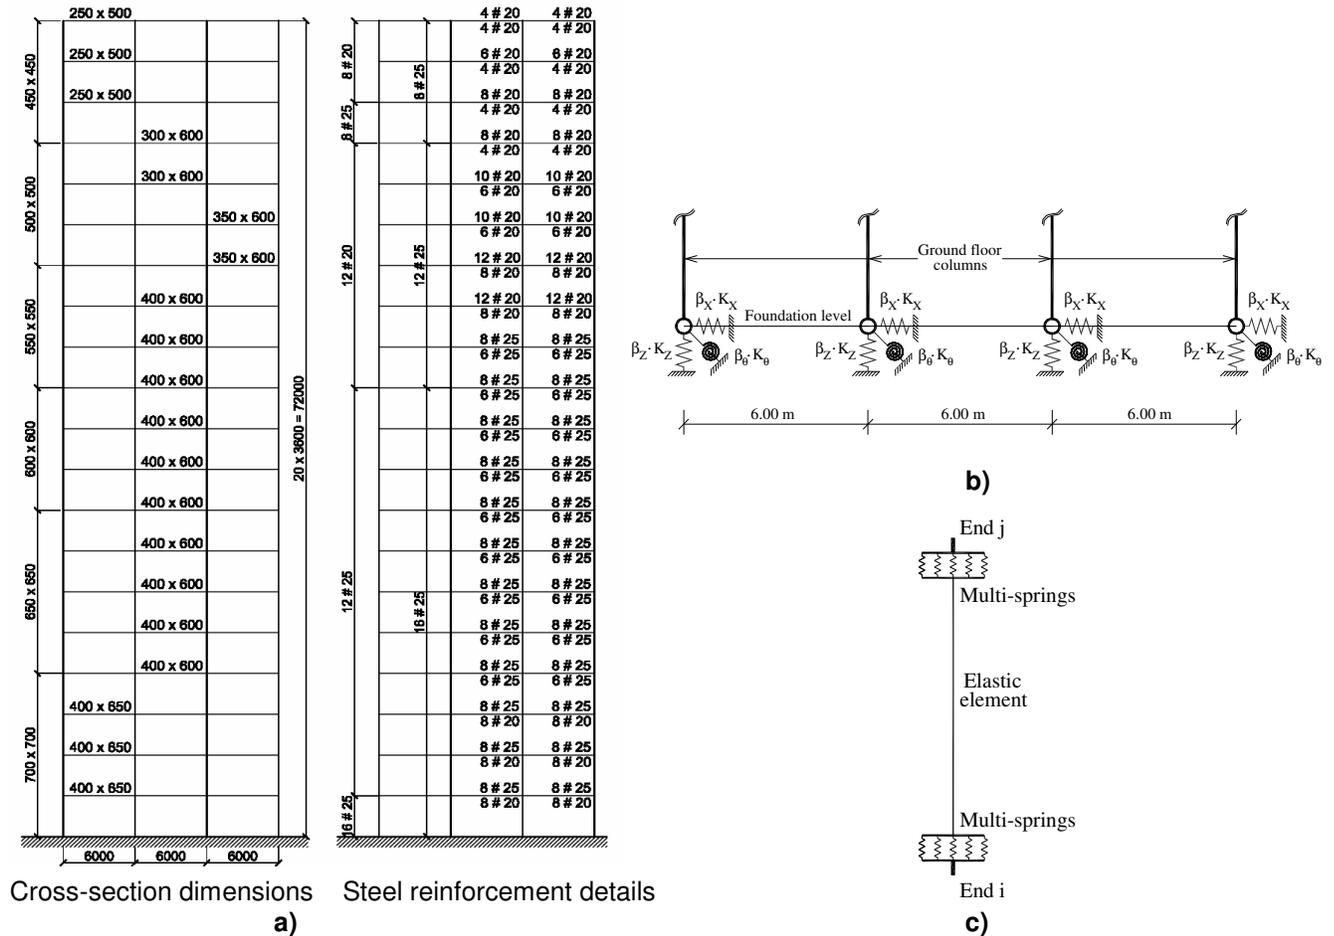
(a) Elevation and cross-section properties of the studied 20-storey building MRFs (Fixed-base model), (b) Modelling of the foundation supports, (c) Multi-spring model.
